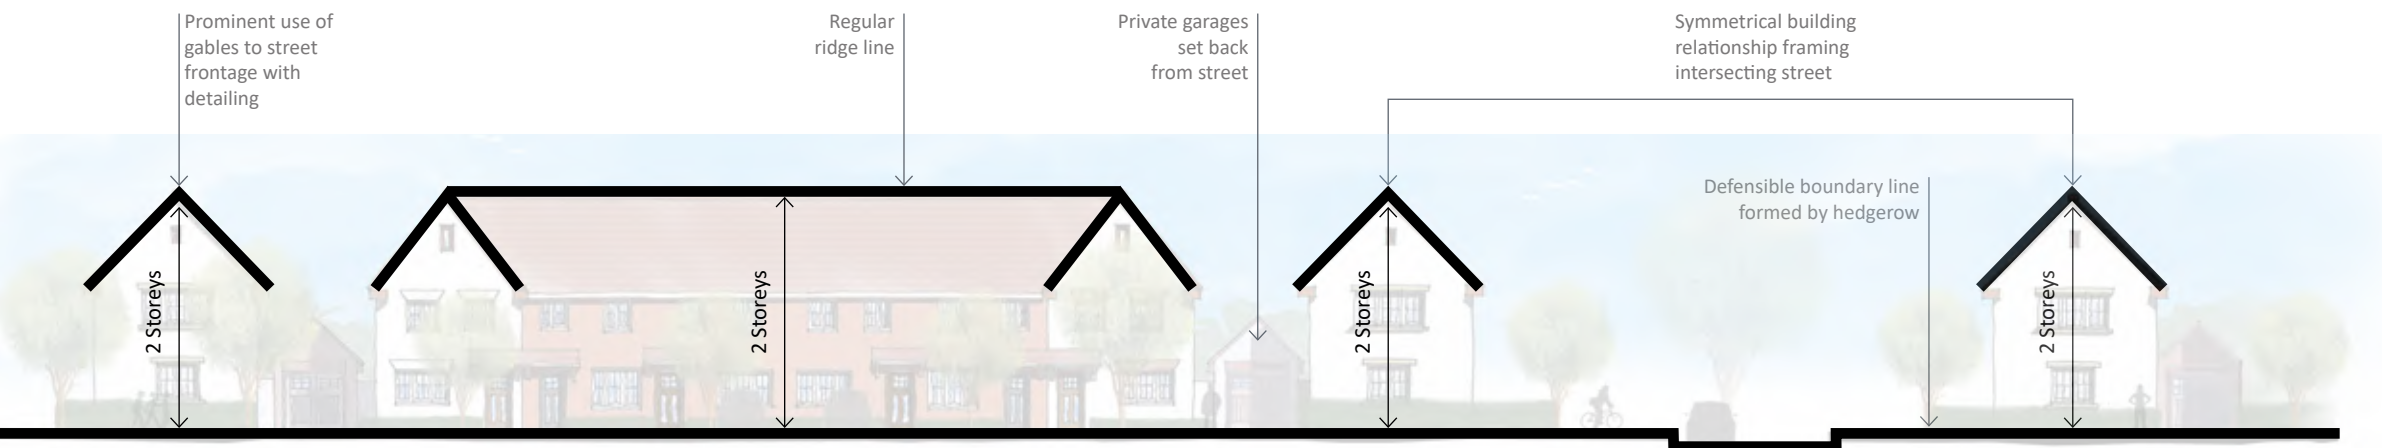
'WARM' STREET ELEVATION PRINCIPLES
